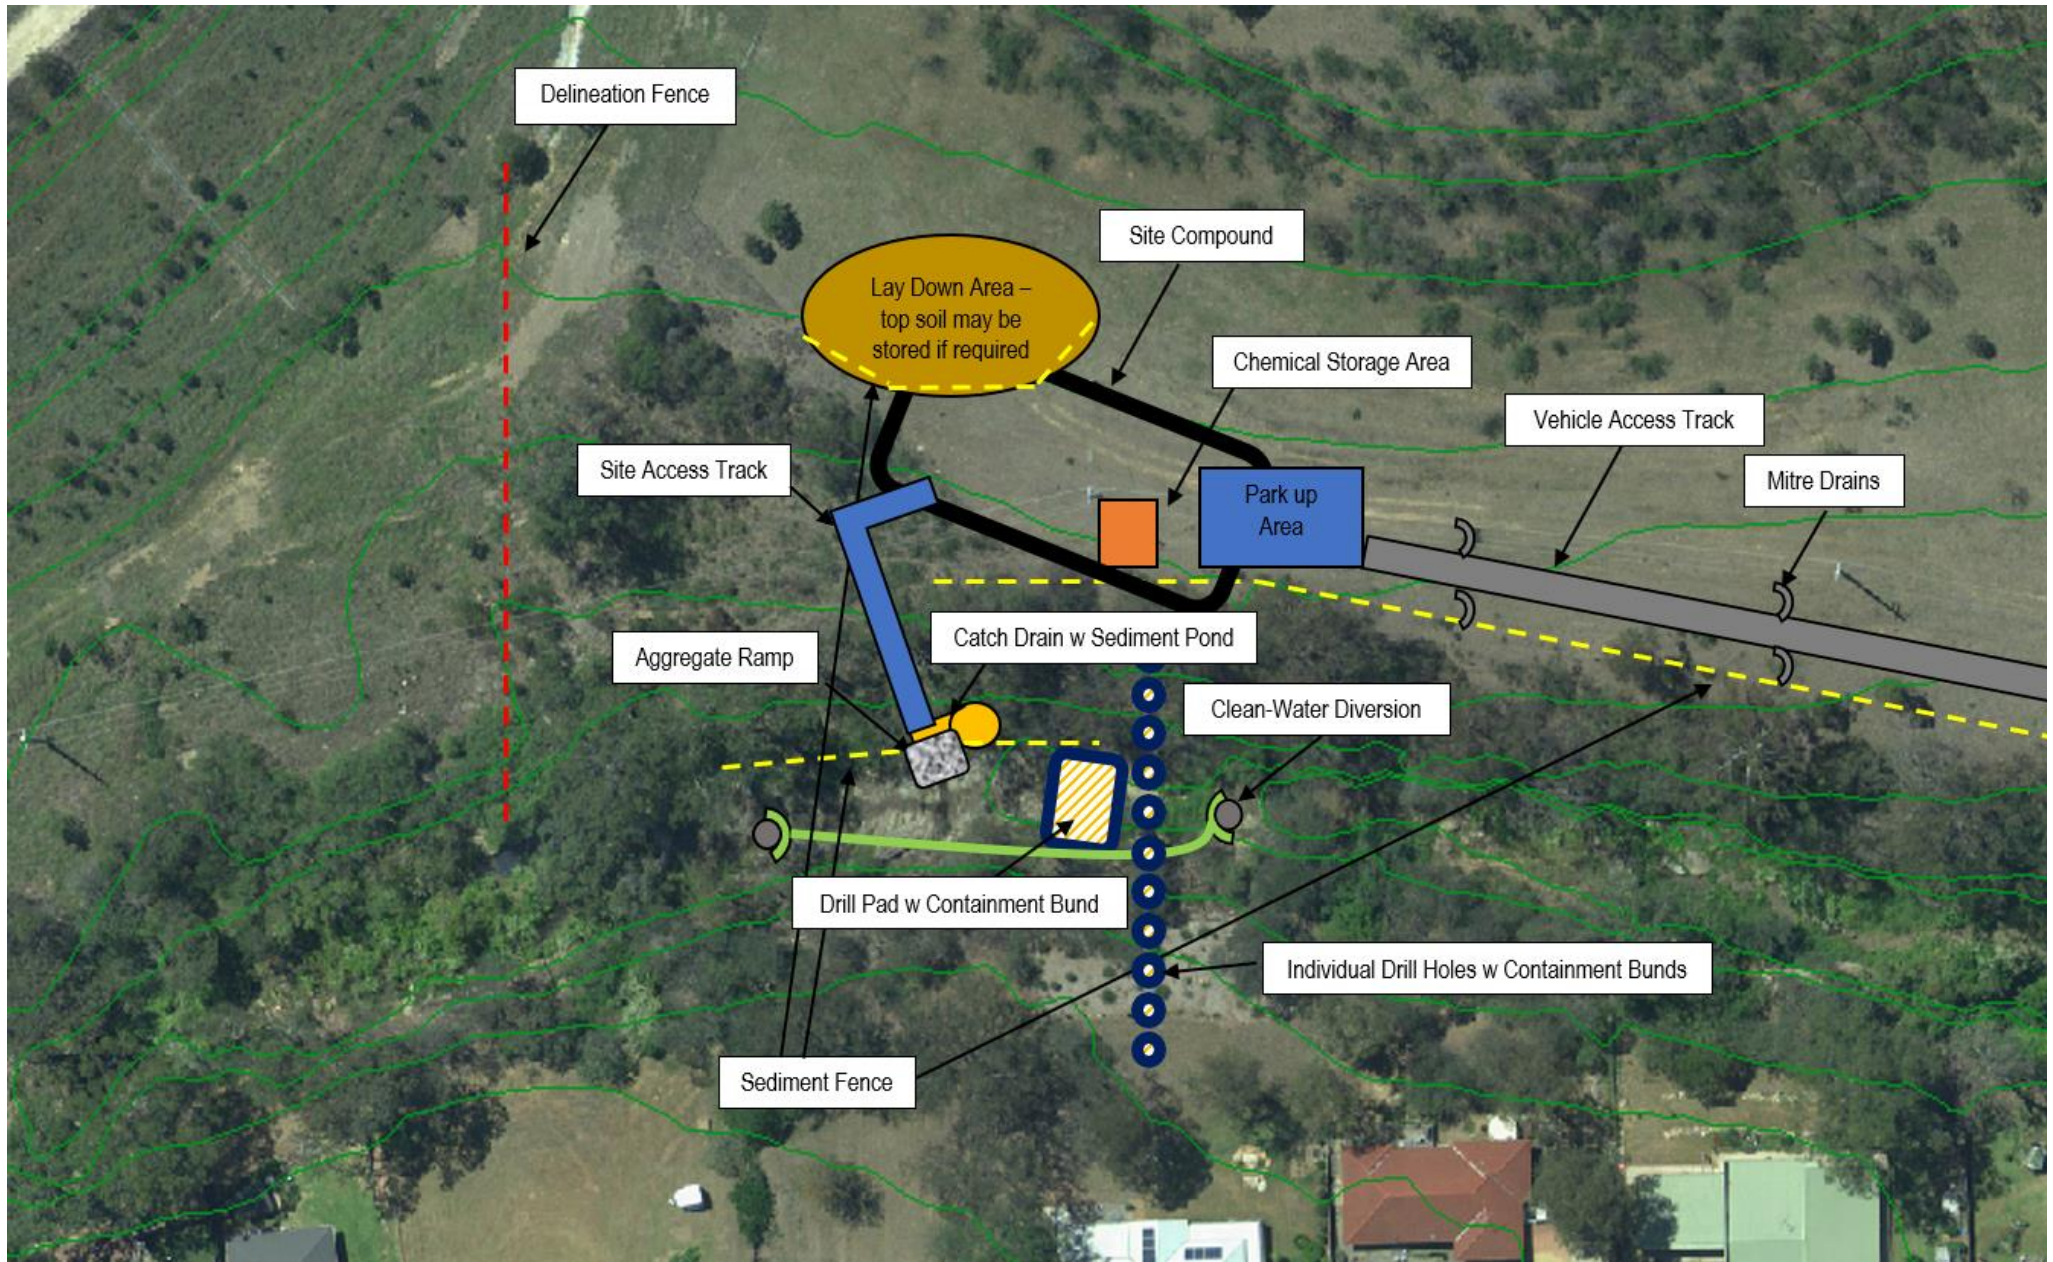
Proposed Site Layout for Grout Curtain Wall Works
